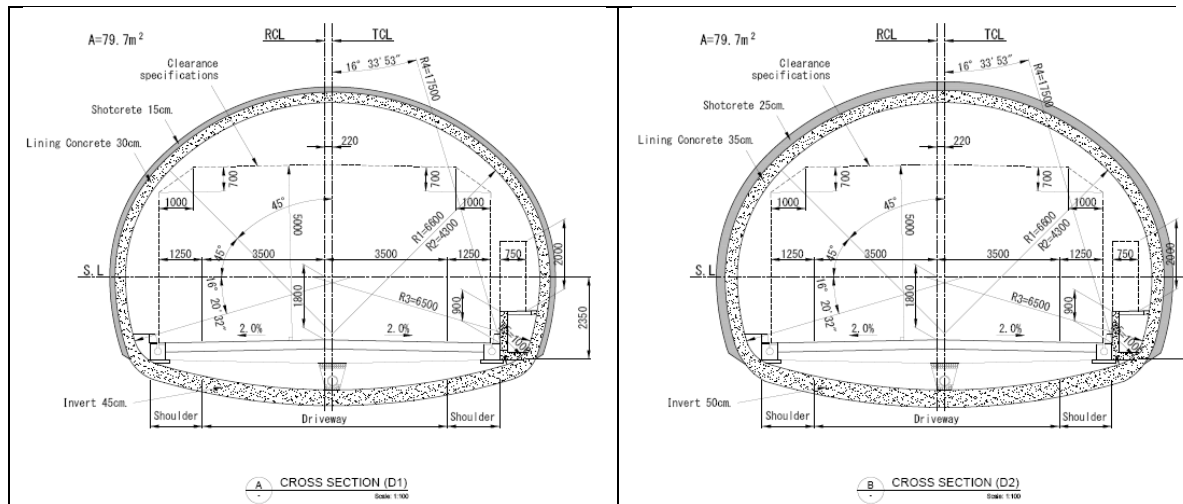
TYPICAL TUNNEL CROSS SECTION (TYPE D)
